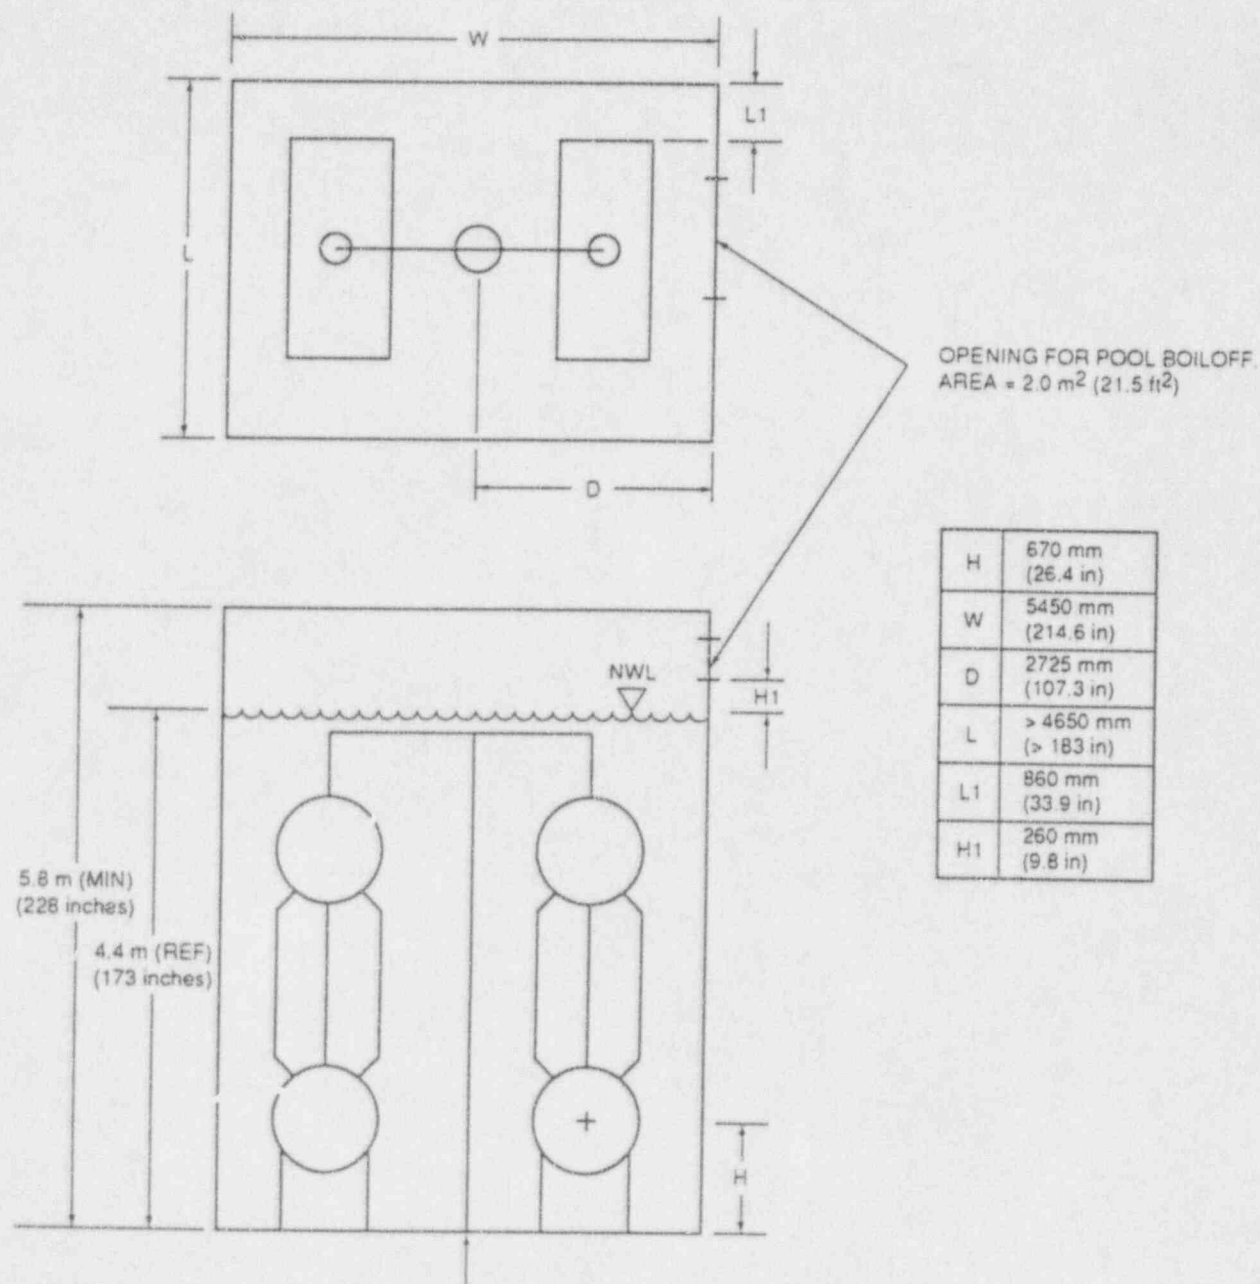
REQUIRED DIMENSIONS FOR PCC TEST POOL
